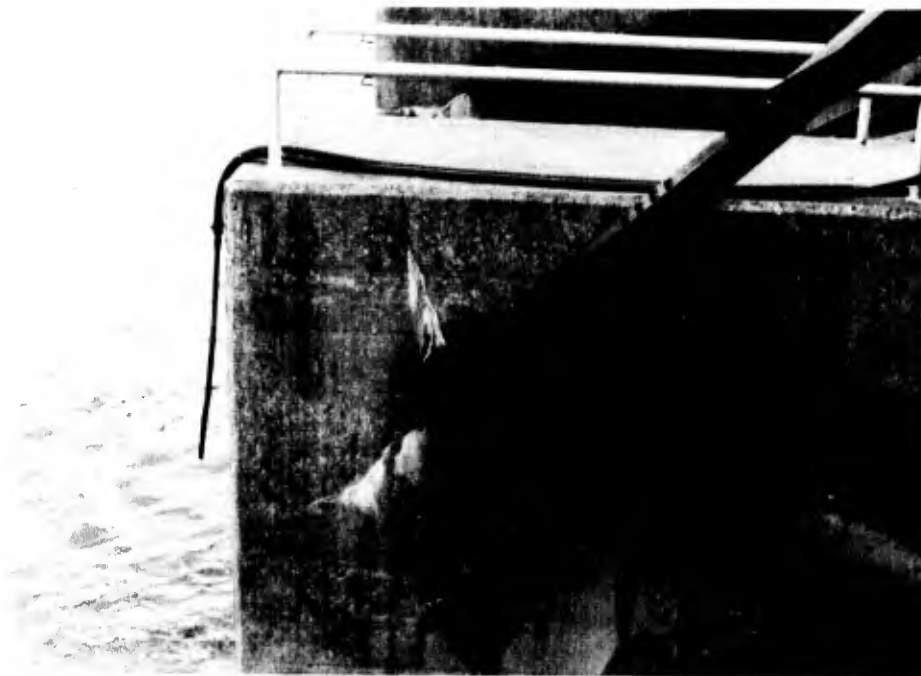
Taken from tainter gate pier No. 1, looking at north side of pier No. 2. Typical cracking through concrete pier at gate hinge pin, Cedars Lock and Dam, Lower Fox River, Wisconsin
